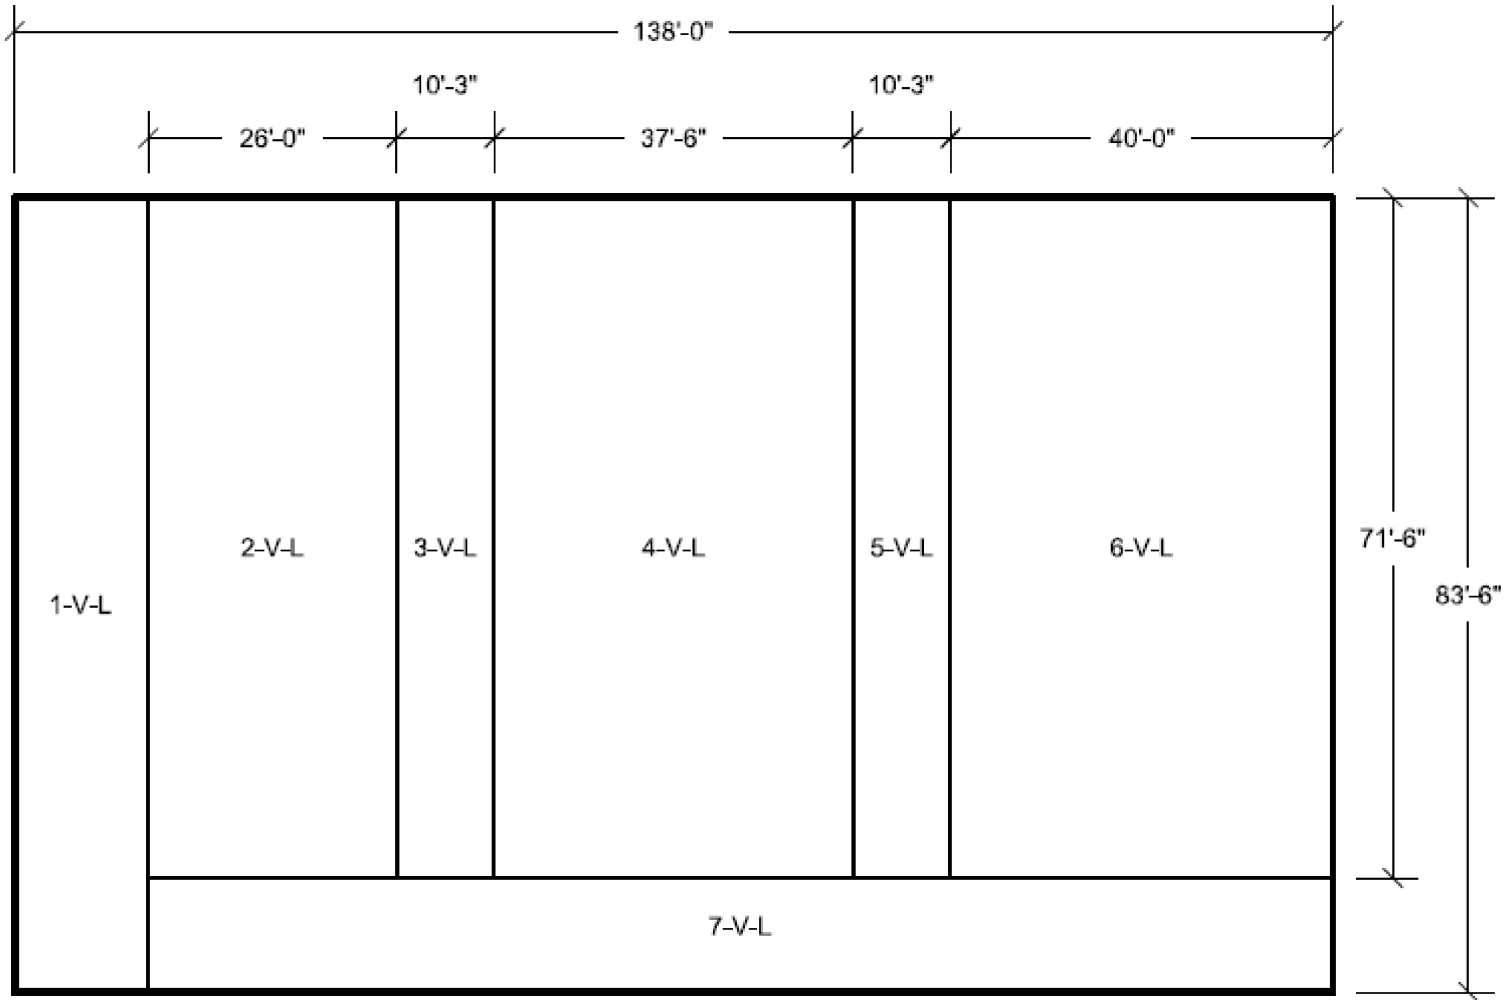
H.6-100 UHS Basin West Wall Looking East Vertical Reinforcement Zones Far Side Face
